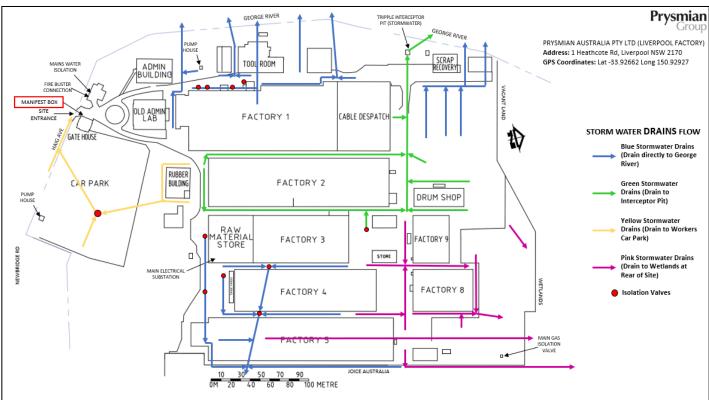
Stormwater Drains and Isolation Valves Layout
